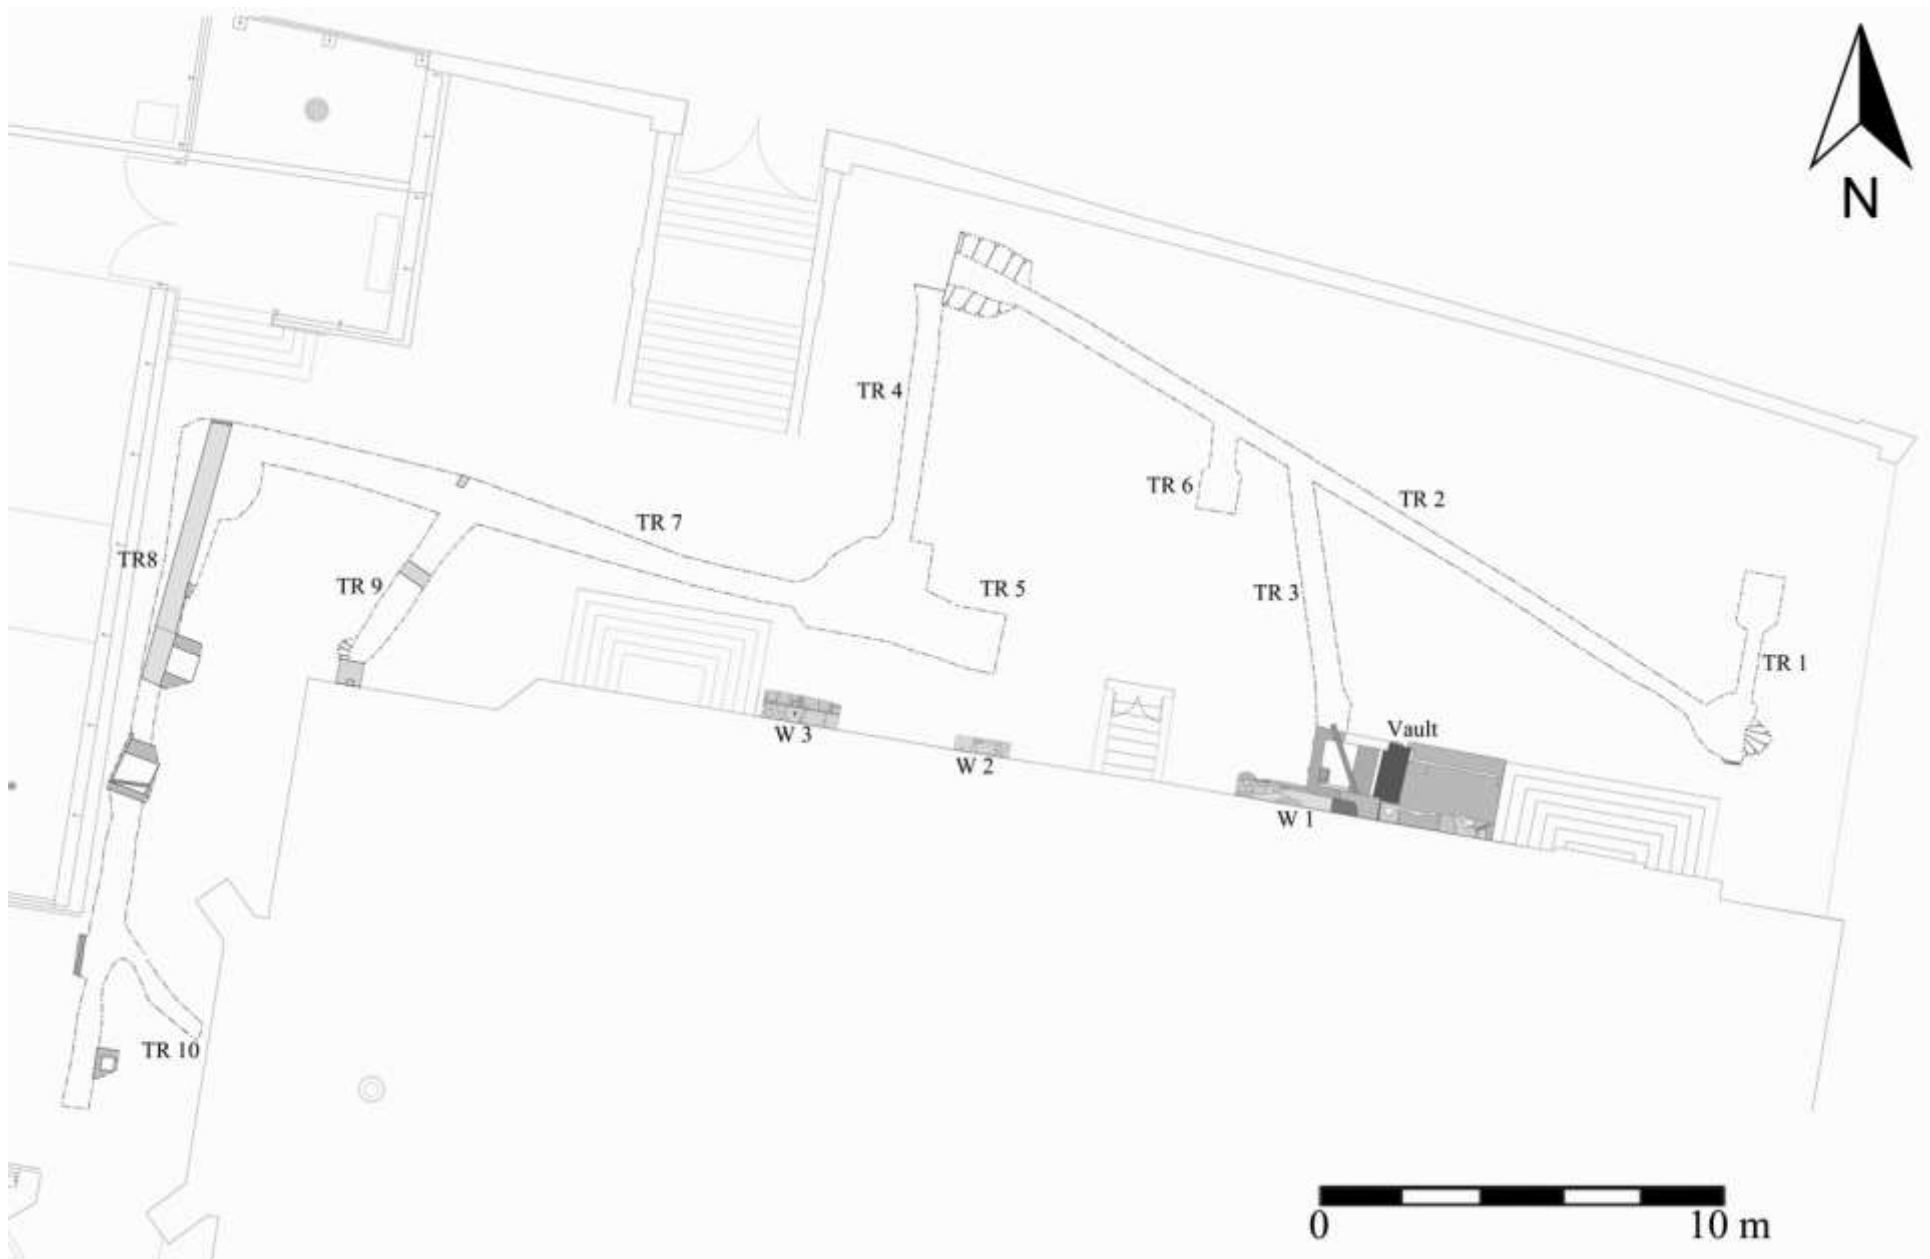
Plan of trenches showing archaeology encountered, (greyscale)
